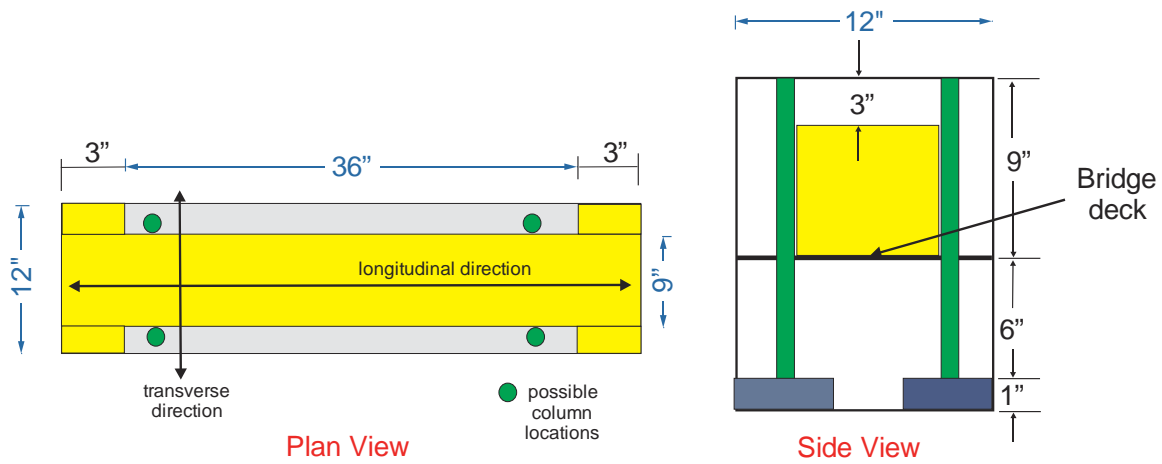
(c) Plan and side views showing one of many possibilities with required obstruction-free areas above the bridge deck (note that if columns are used, they must be placed within the 1.5" space on the edges of the bridge deck as shown)
